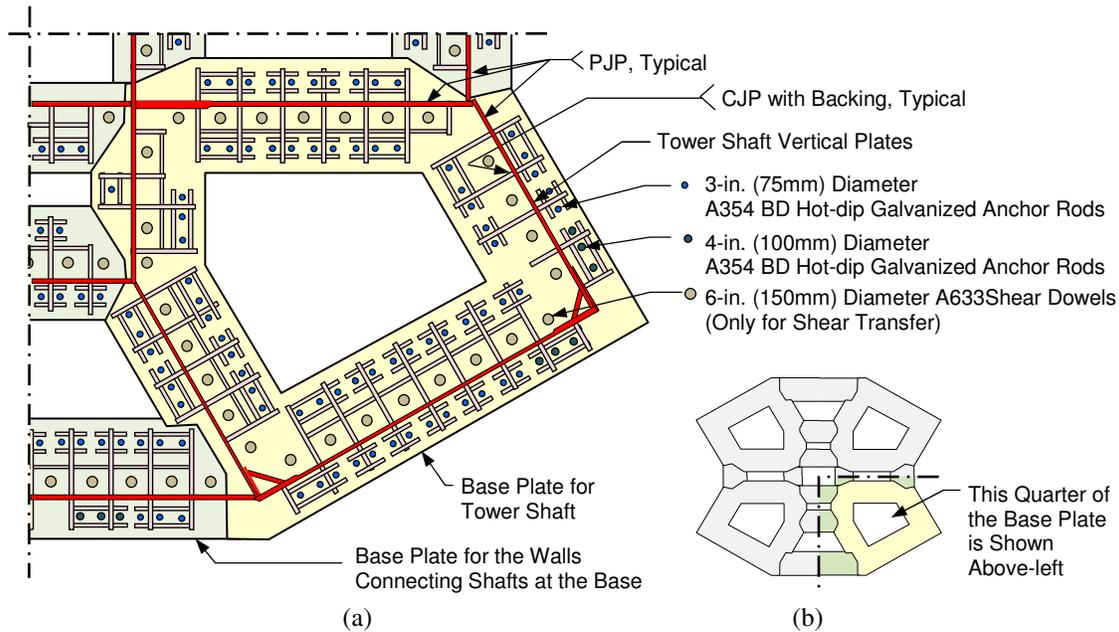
Plan of the Base Plate and Location of Anchor Rods
